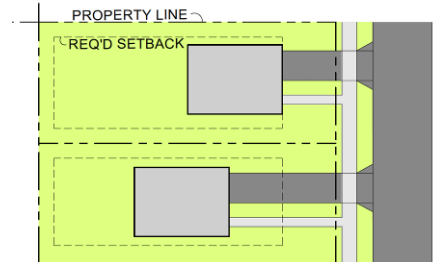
Exceeding setbacks generates additional paved sidewalks and driveways.
